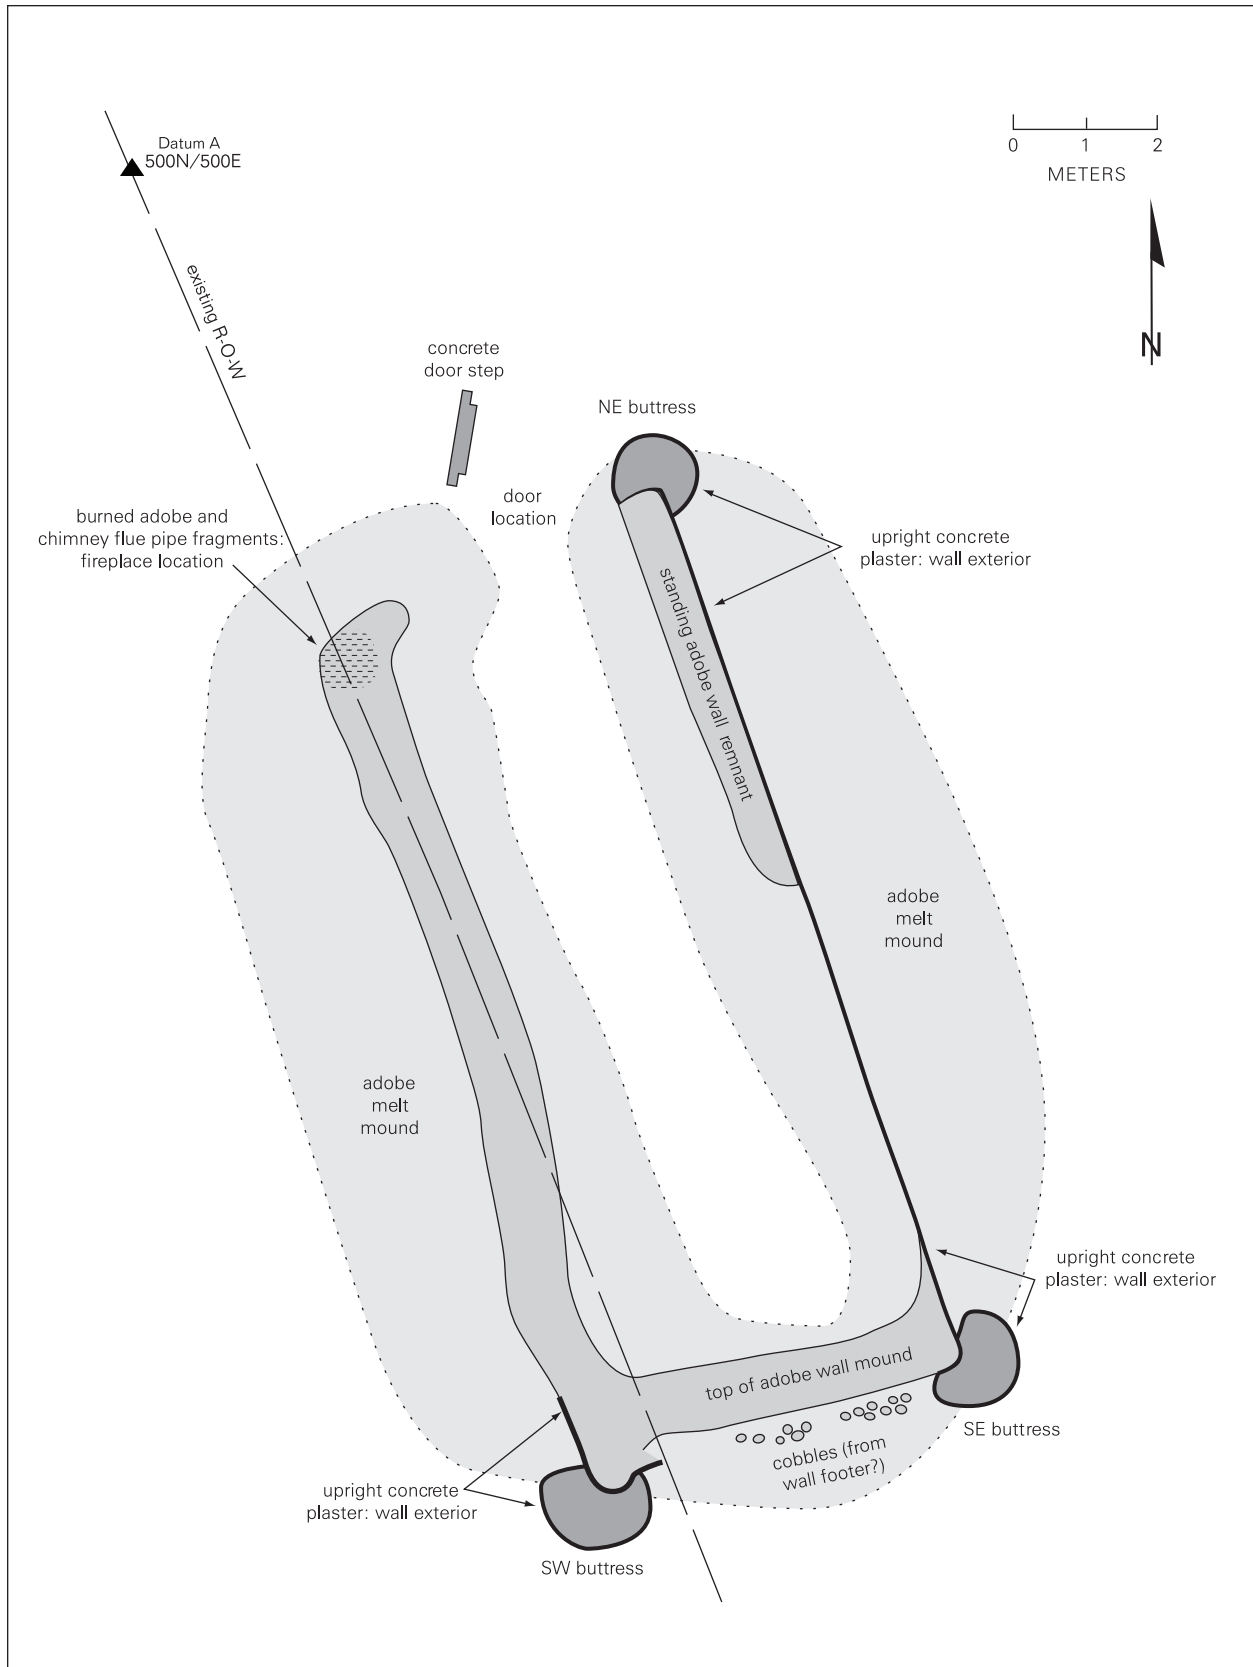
Plan of Structure 1, the Gavilan morada meeting house, LA 105710.
